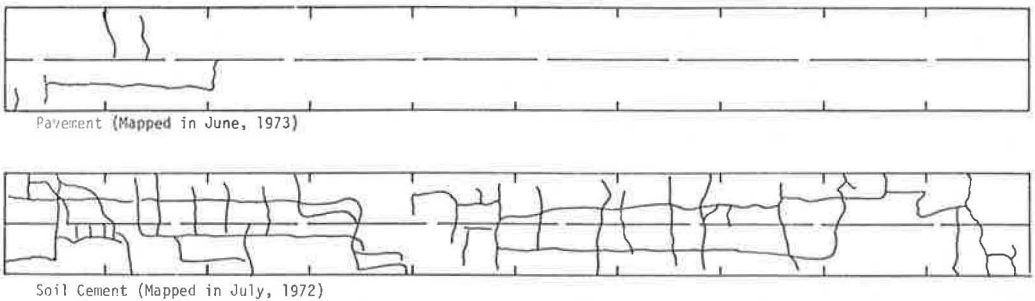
Cracking pattern of soil-cement base and superimposed pavement for experimental section with lime additive (one mixing).
